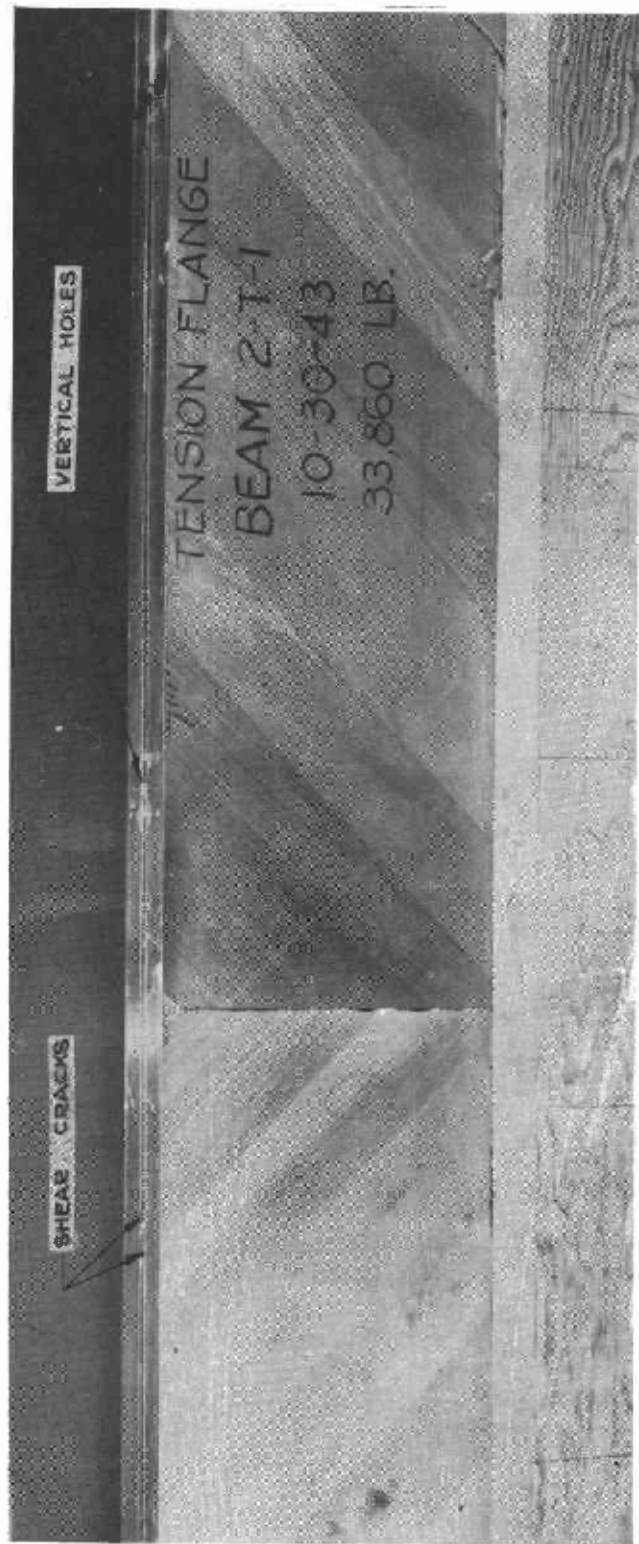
Beam 2-T-1 after failure, showing lengths of the shear cracks that started at edges of holes.
